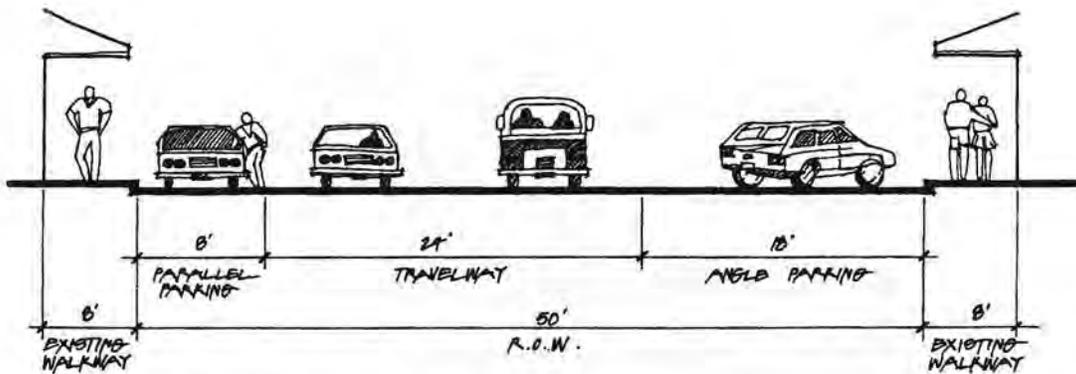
PROPOSED HANA HIGHWAY—SECTION
